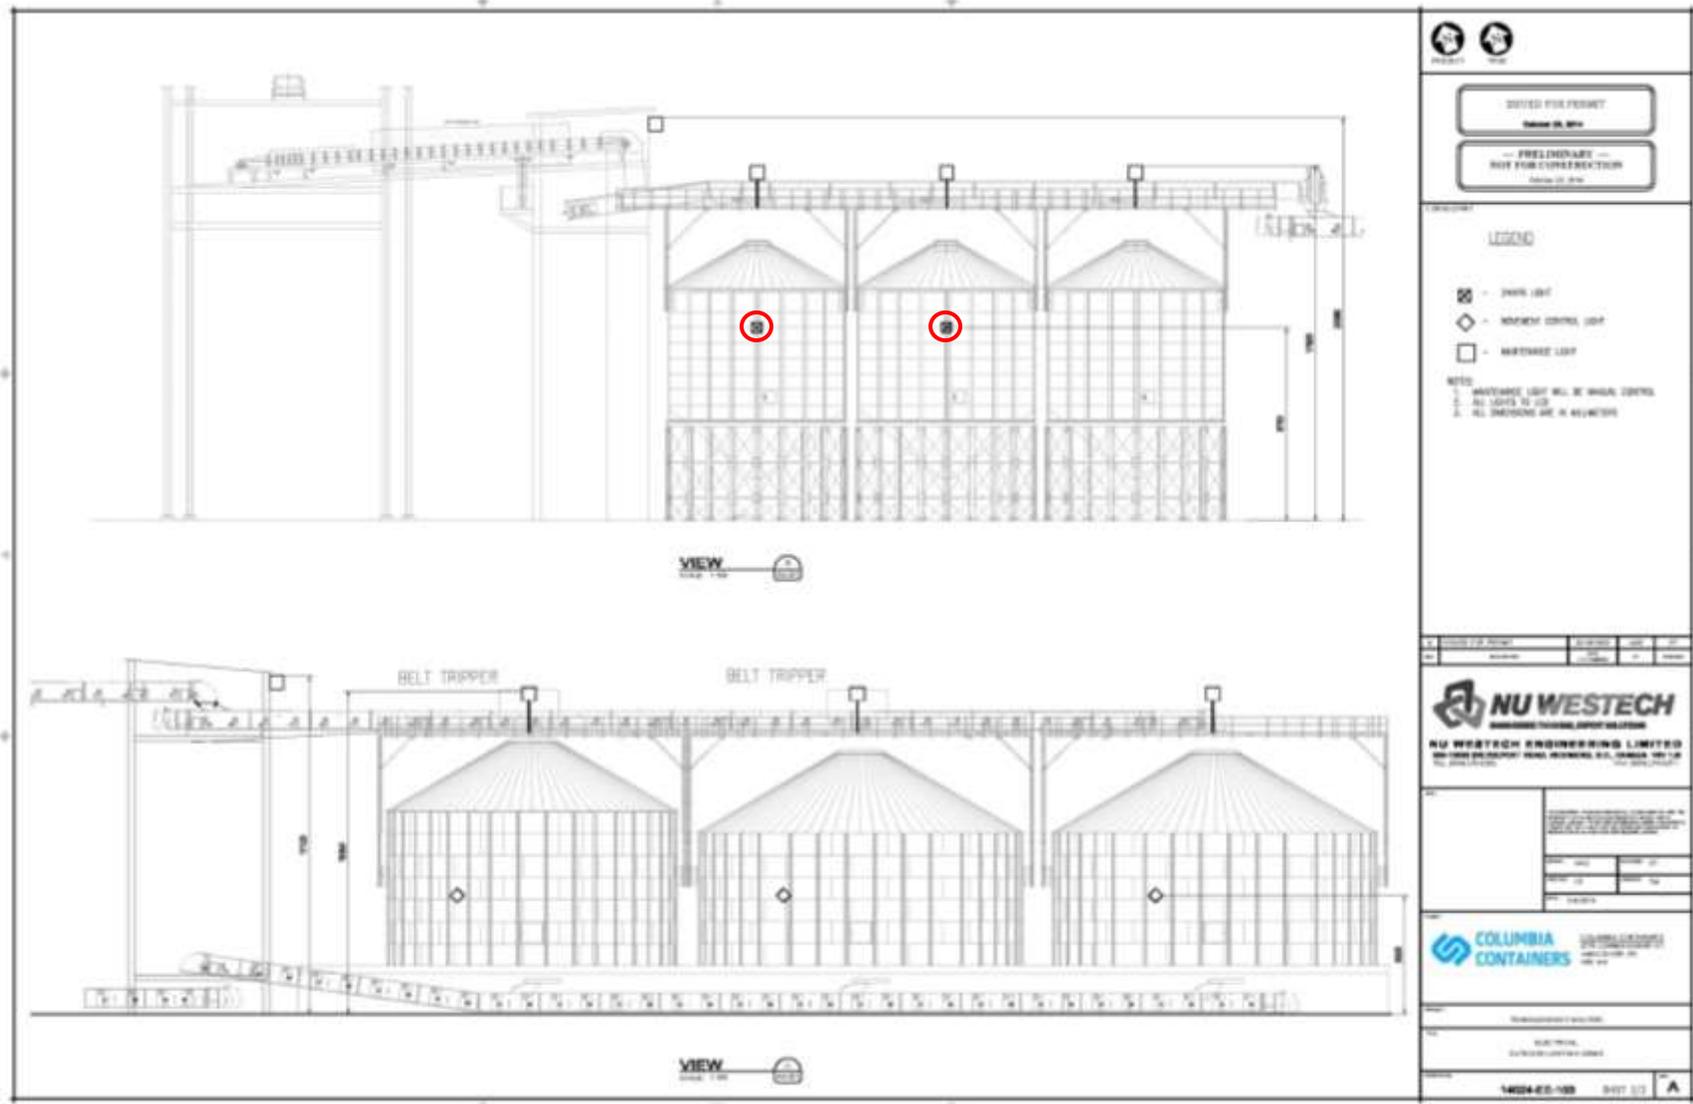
Columbia Containers Outdoor Lighting Plan: view 2, floodlights circled in red (Nu-Westech Engineering Ltd 2014)
